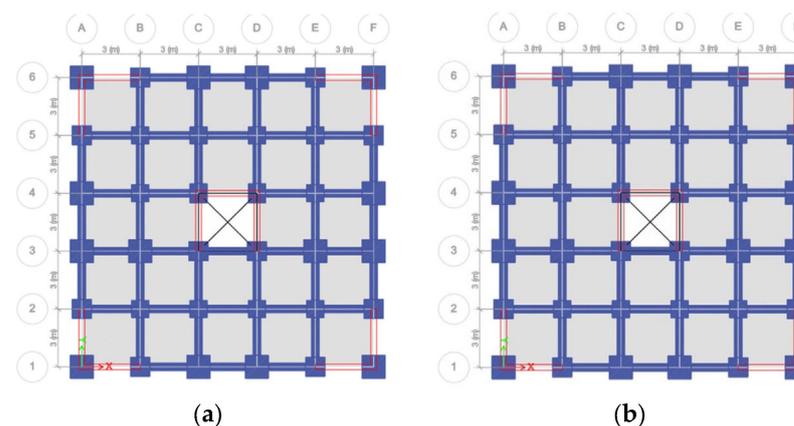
(a) G + 50 shear wall with opening Floor Plan; (b) G + 50 shear wall without opening Floor Plan.
